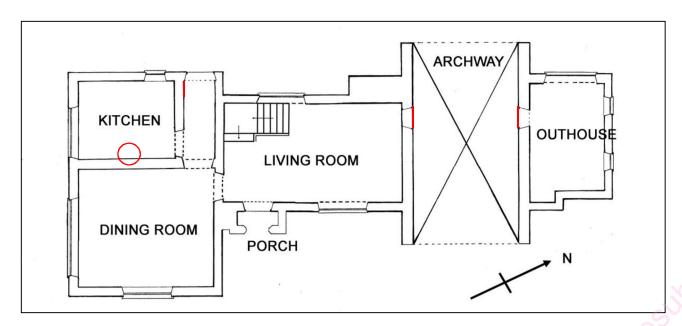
Ground floor plan by BAS, annotation: circle location of blocked fireplaces, line location of blocked doors
